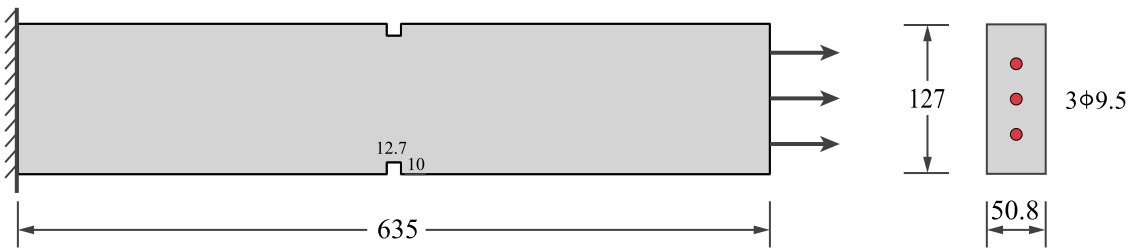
Geometric information and loading conditions of the notched RC panel (Unit: mm).
